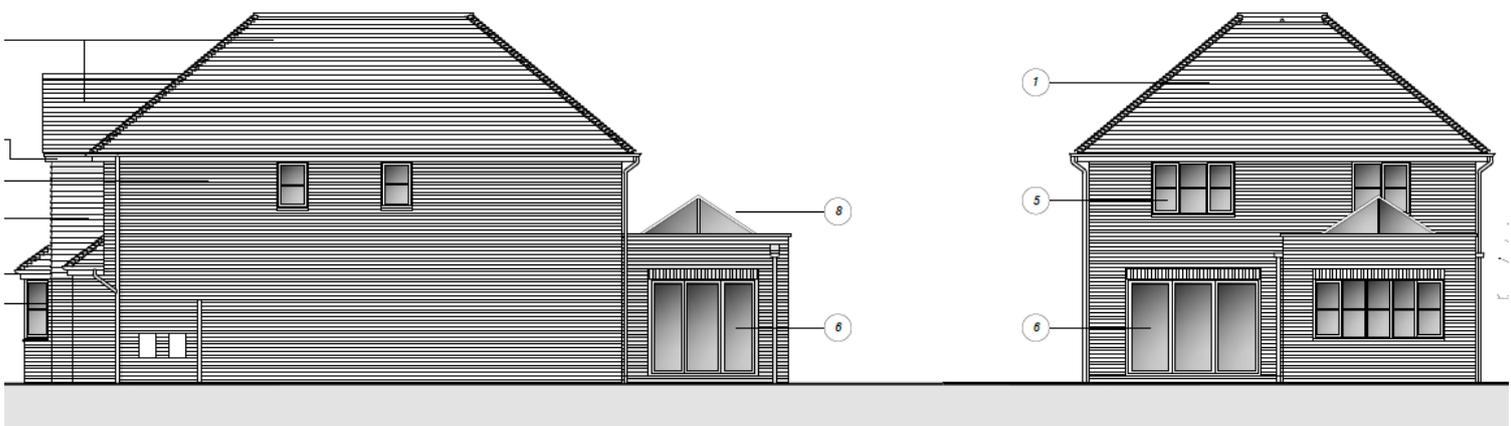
Side (East) Elevation & Rear (South) Elevation
